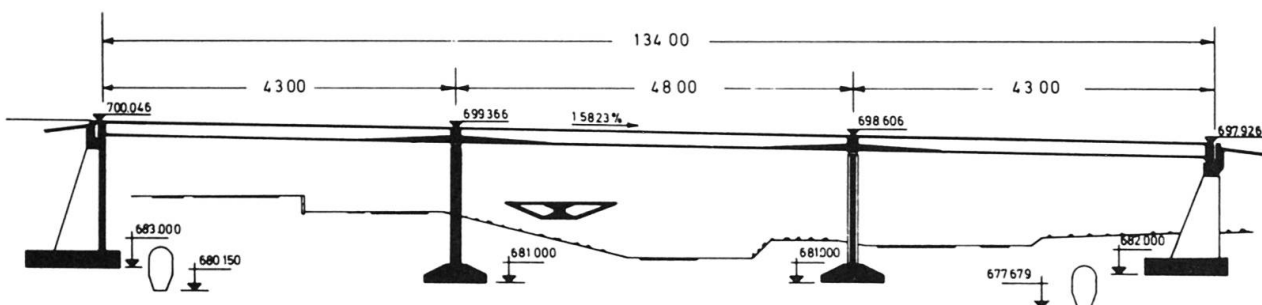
"Cuzco - Barajas" Bridge over motorway M-30 in Madrid (Spain). Longitudinal section.
